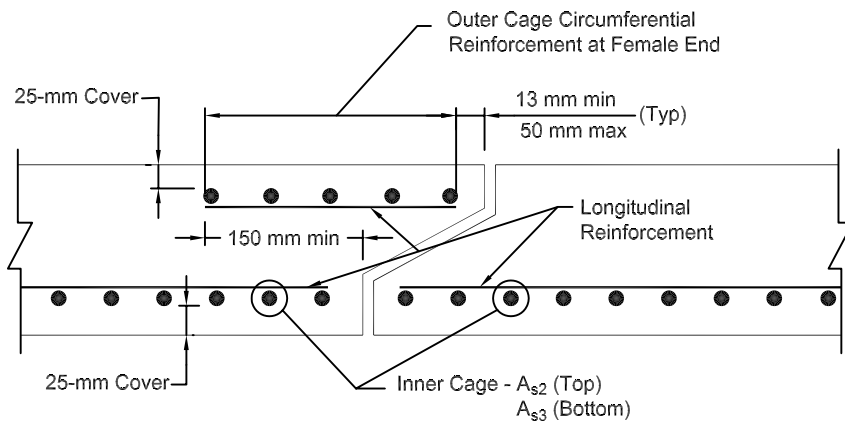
Section A-A Top and Bottom Slab Joint Reinforcement
